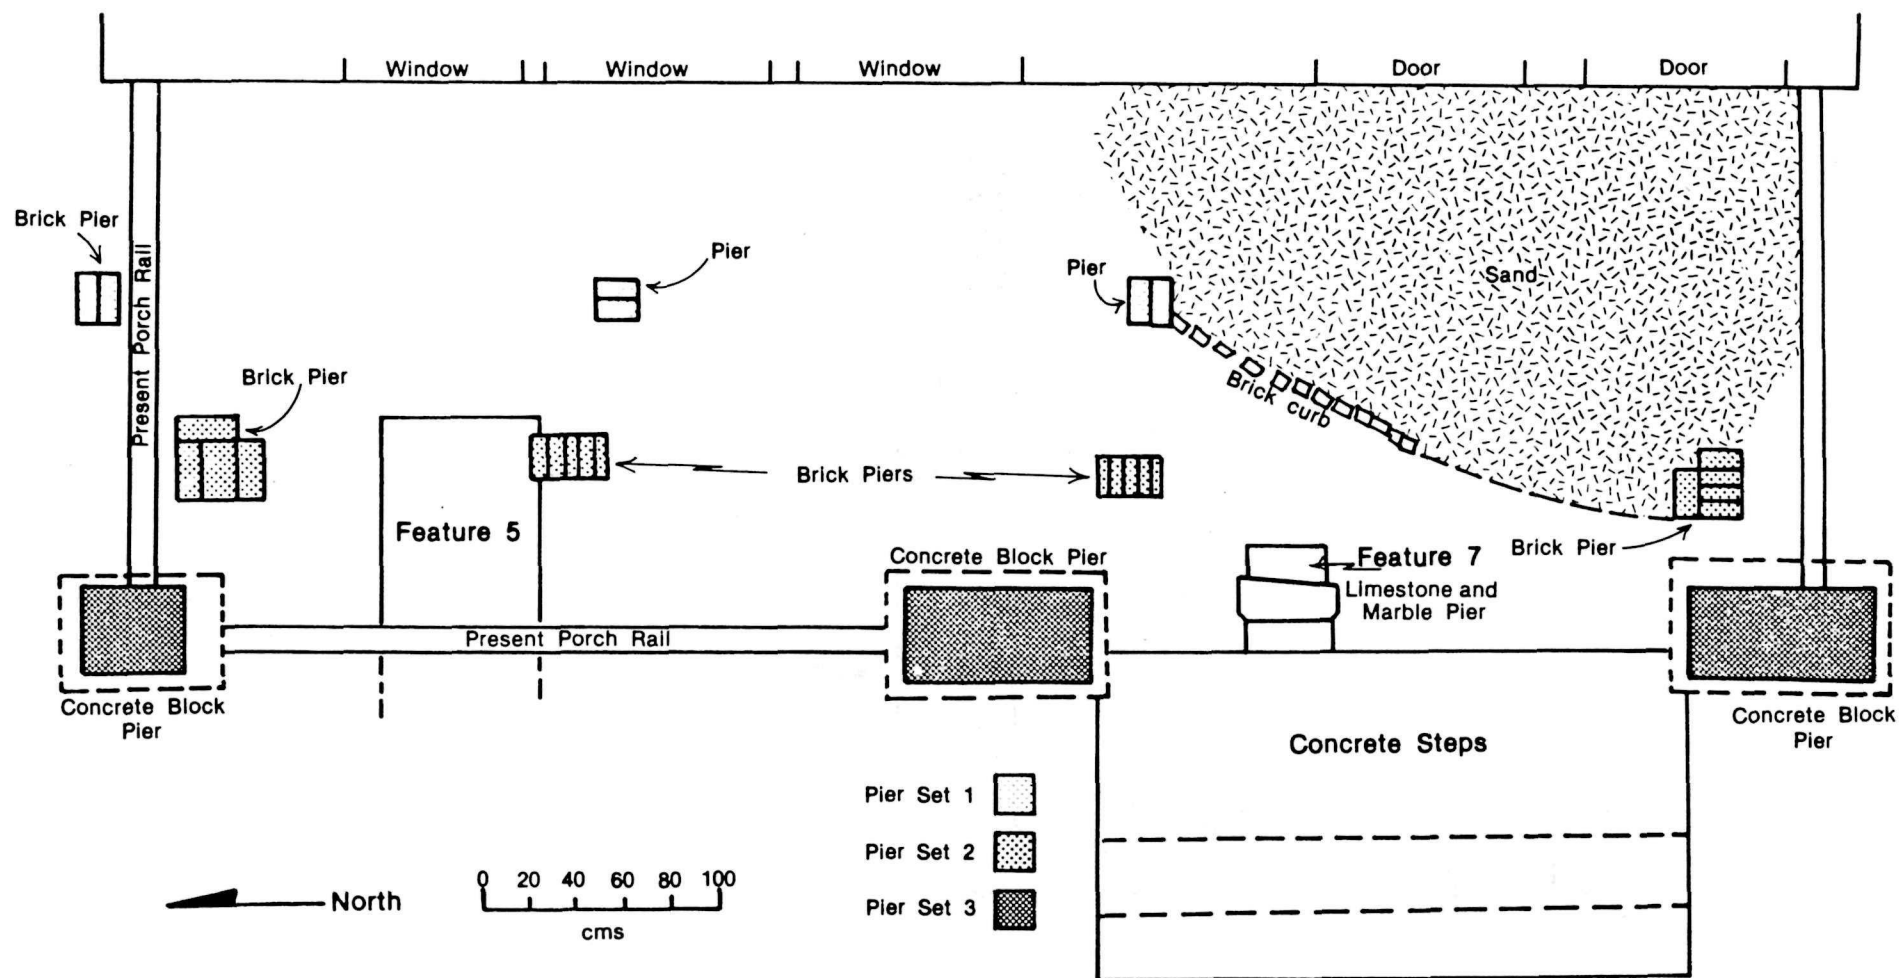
The Cook Site, Test 4 (Front Porch) Plan View.
